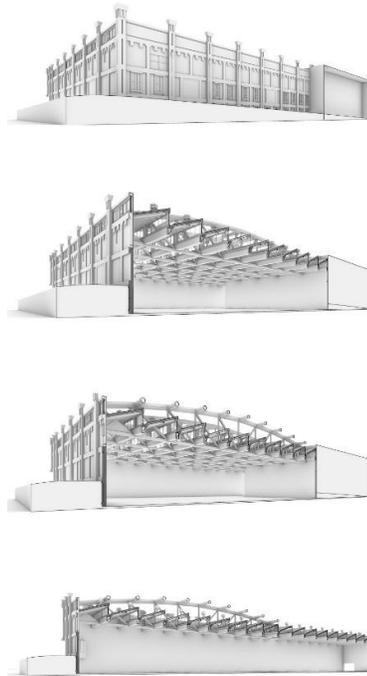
The sequential sectional perspectives to demonstrate the roof structure that consist of the various components include the reinforced concrete bowstring trusses and saw-tooth roof system.
